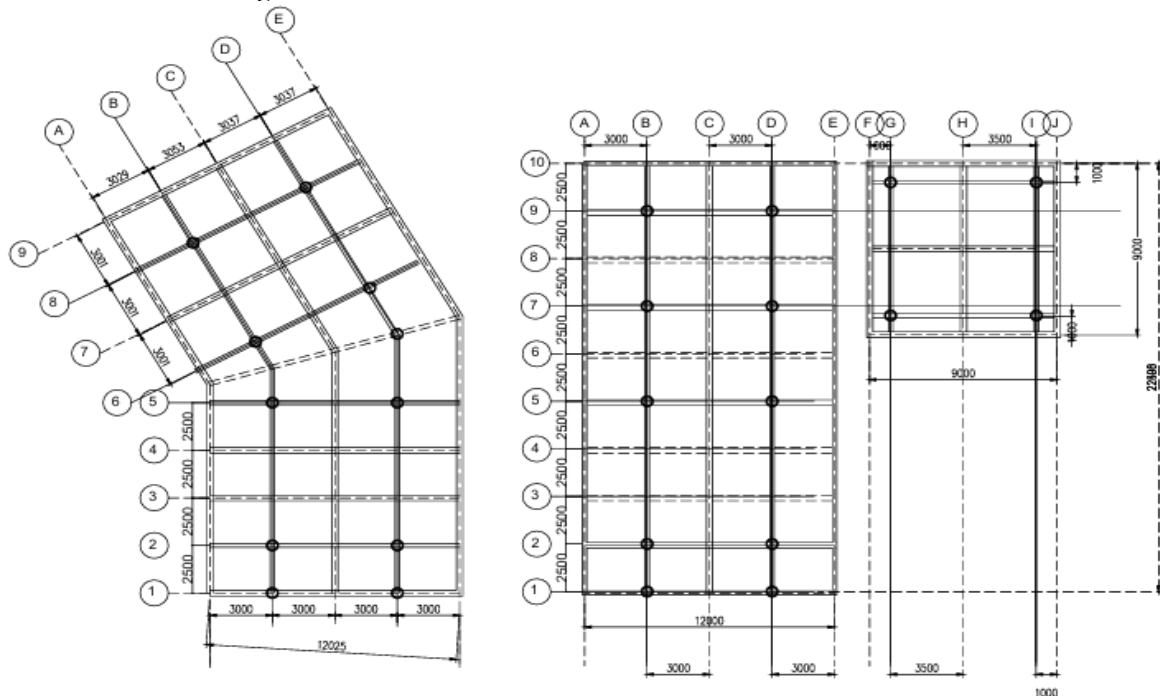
Beam and Column Layout Plan for the ITK Canteen, Scale 1 : 200
